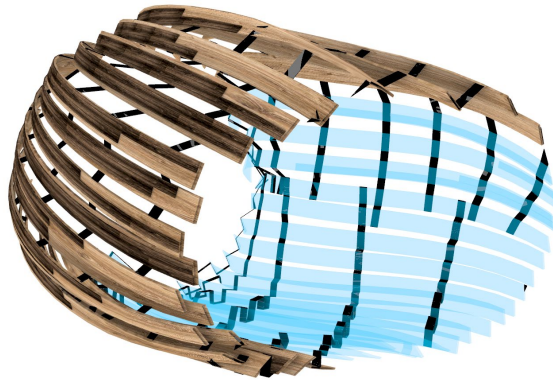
A sectional perspective of a typical assembly of boards and brackets
